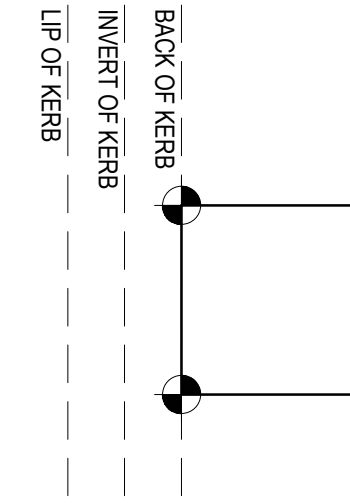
C-262 — Project No. 10029435 — Issue 01
